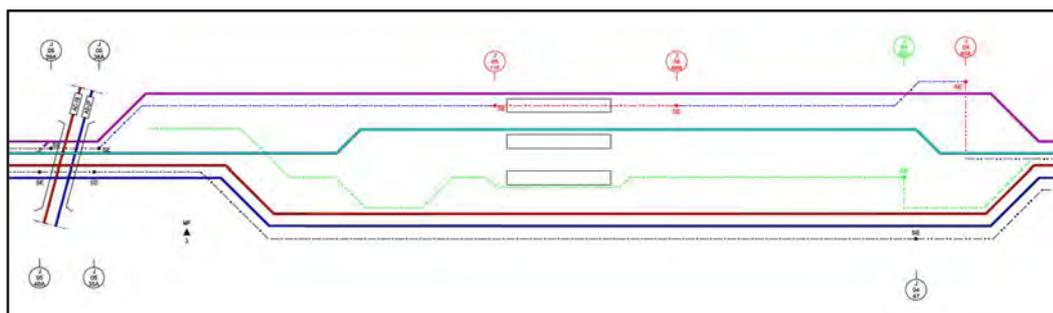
Proposed sectioning update for Christmas 2024 blockade works
